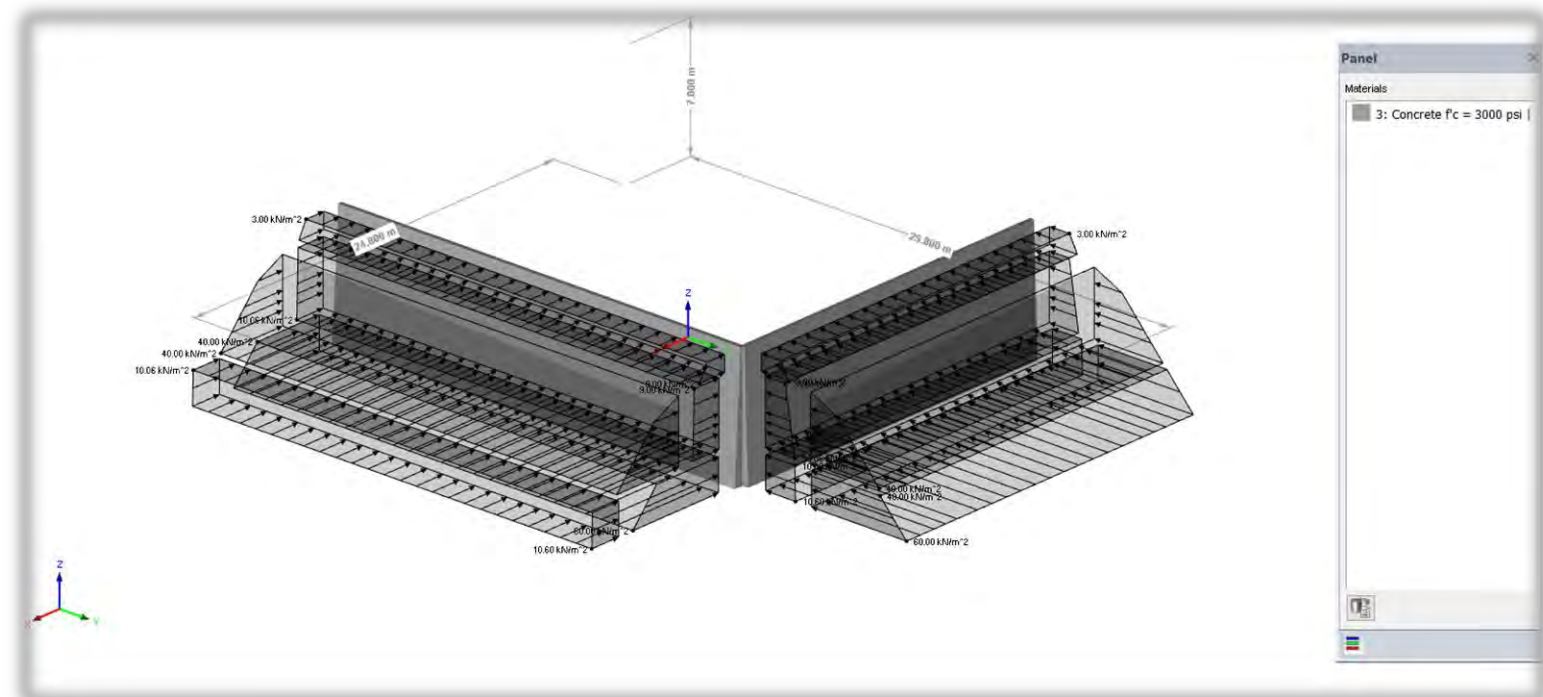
Assign of Soil Pressure on the pool's walls (KN-M<sup>2</sup> Units)
